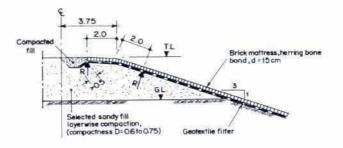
Typical detail at embankment top with anchoring of geotextile filter mat
